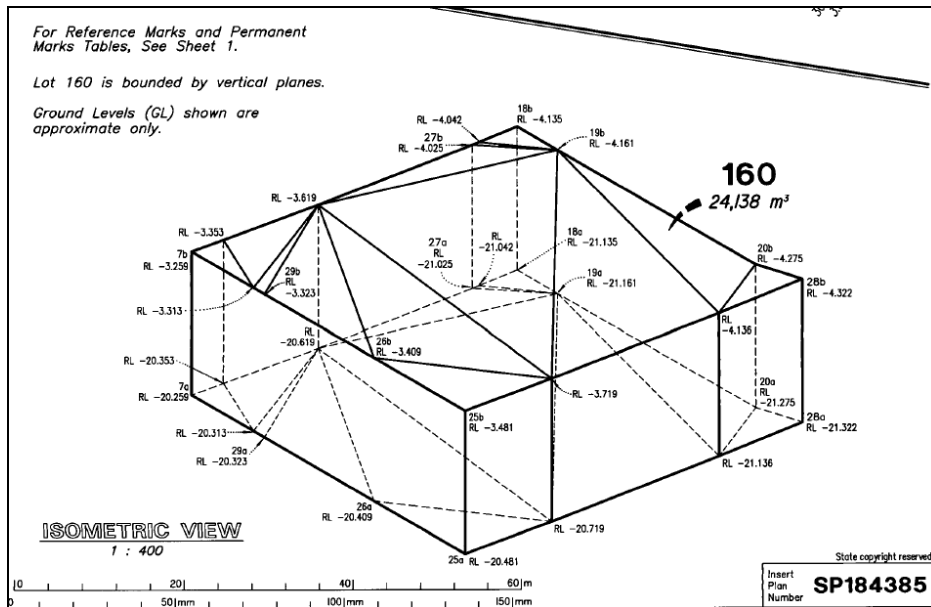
A section of underground road tunnel directly below Lot 4. The upper and lower surfaces are not horizontal. (Lot 160 on SP184384)
